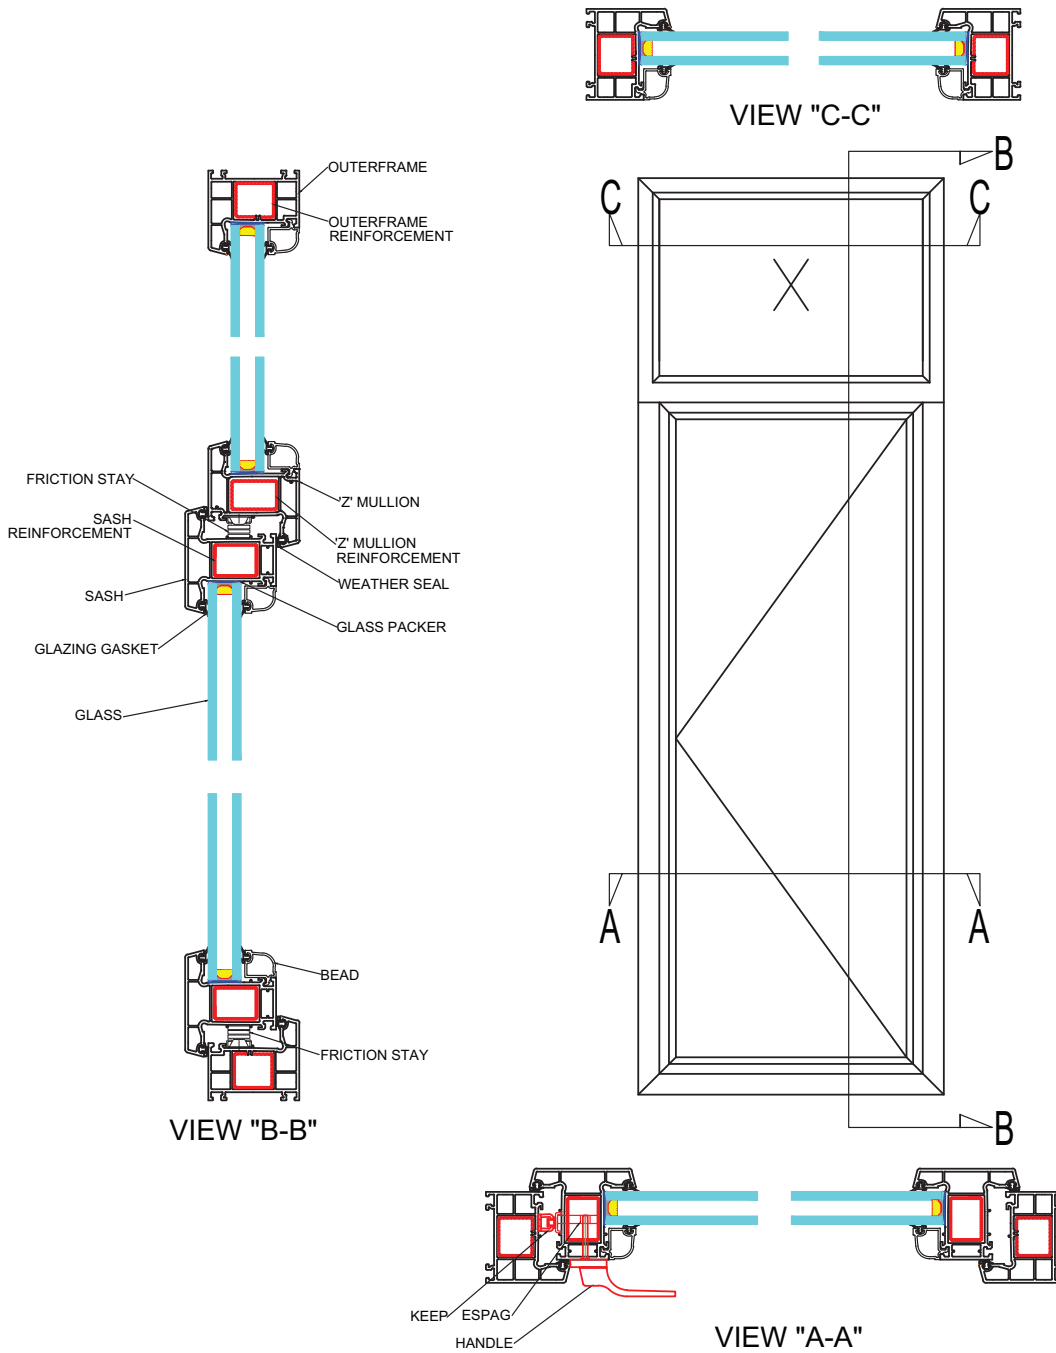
uPVC Doors and Windows (Typical casement with top fixed system)
